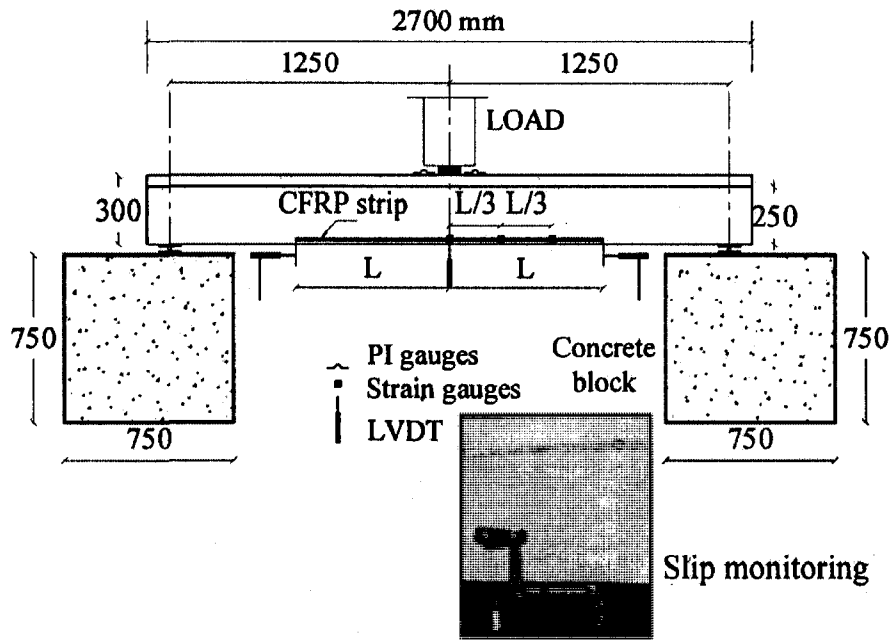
Test Specimen, (Hassan and Rizkalla 2003)
